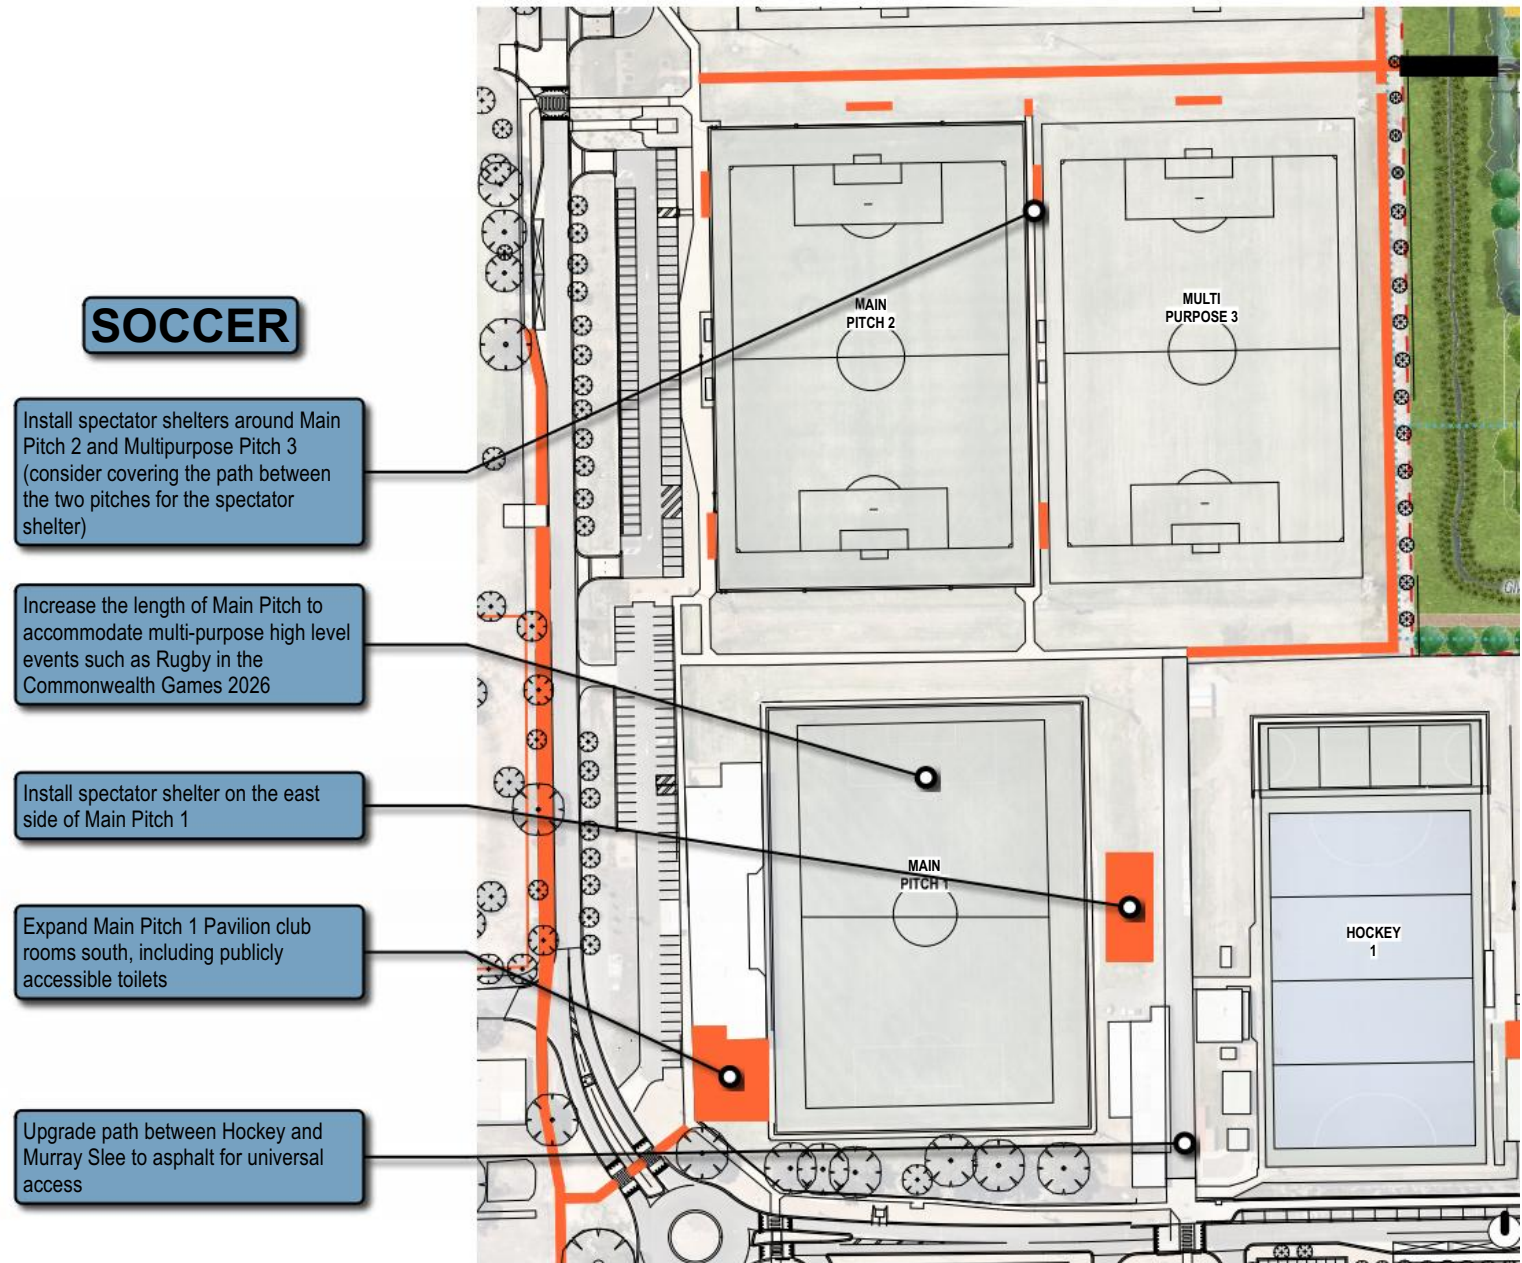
Proposed site plan of the Stadium development (Adopted from City Collective)
